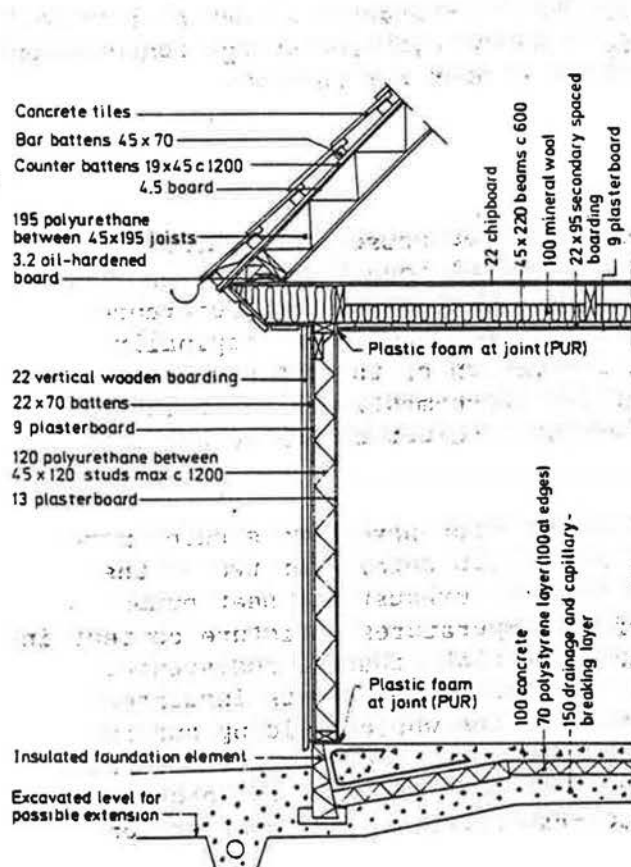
The picture above shows the house facades facing the street. The facades are of vertical wooden boarding. On the left, a cross-section of the house construction. The houses are to a fairly high degree prefabricated. The foundation elements, which are left in position, act as forms for the concrete slab which is cast on the spot. These foundation elements consist of a core of polystyrene foam surrounded by an outer layer of concrete reinforced with steel-fibre and glassfibre.
